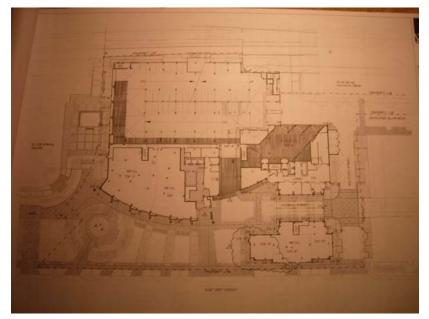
First Floor and Overall Site Plan showing overall shape for lower floors.
